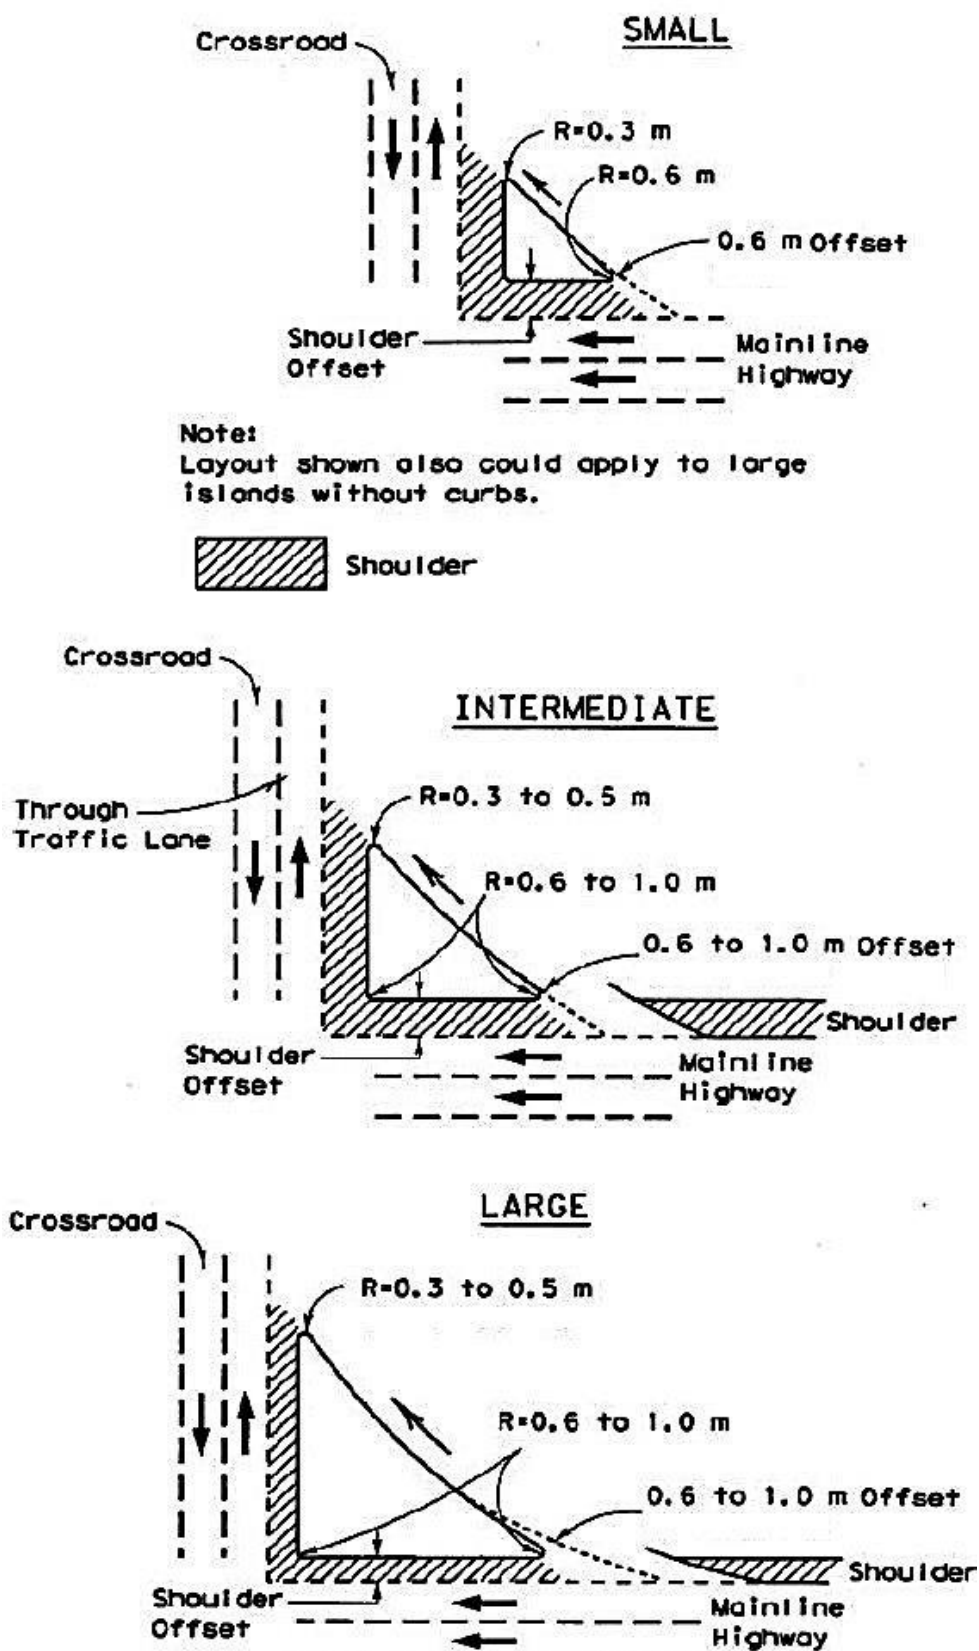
/4: Layouts of curbed island with shoulders [2, p. 293]
